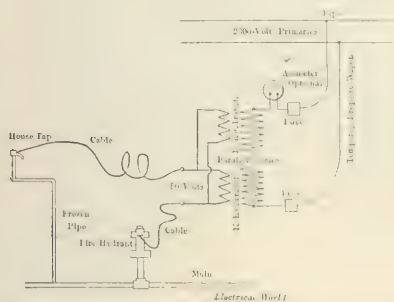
ASSEMBLY OF APPARATUS FOR THAWING WATER PIPES
